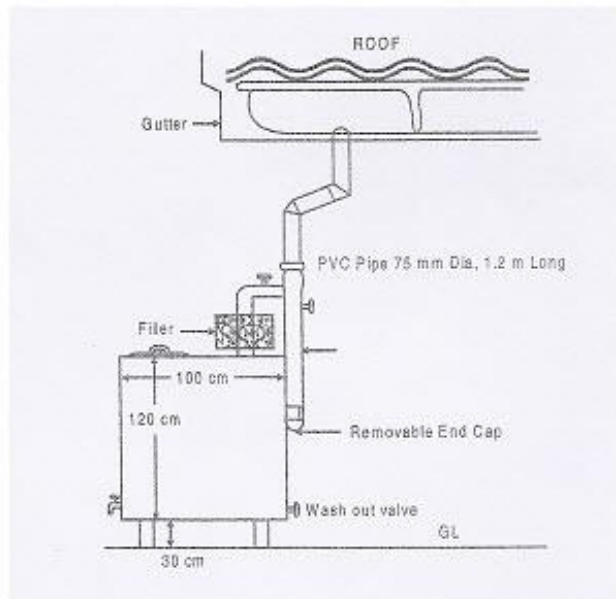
A Typical Roof Water Harvesting System. (Source: Patel and Shah, 2008)
